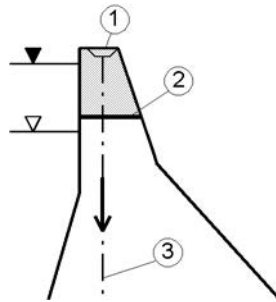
Prestressing at dam heightening. (1) Anchoring into the new concrete crest; (2) joint between the old and the new concrete; (3) prestressed cable.
